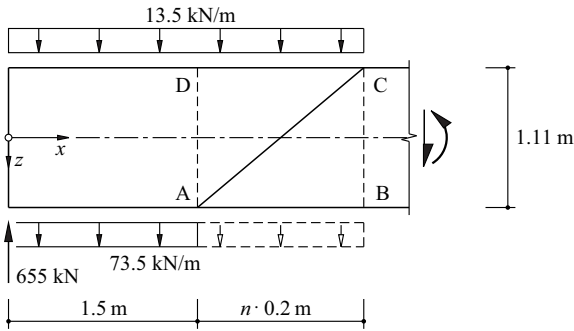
End of beam with open end A of collapse crack and curtailed tension chord reinforcement
